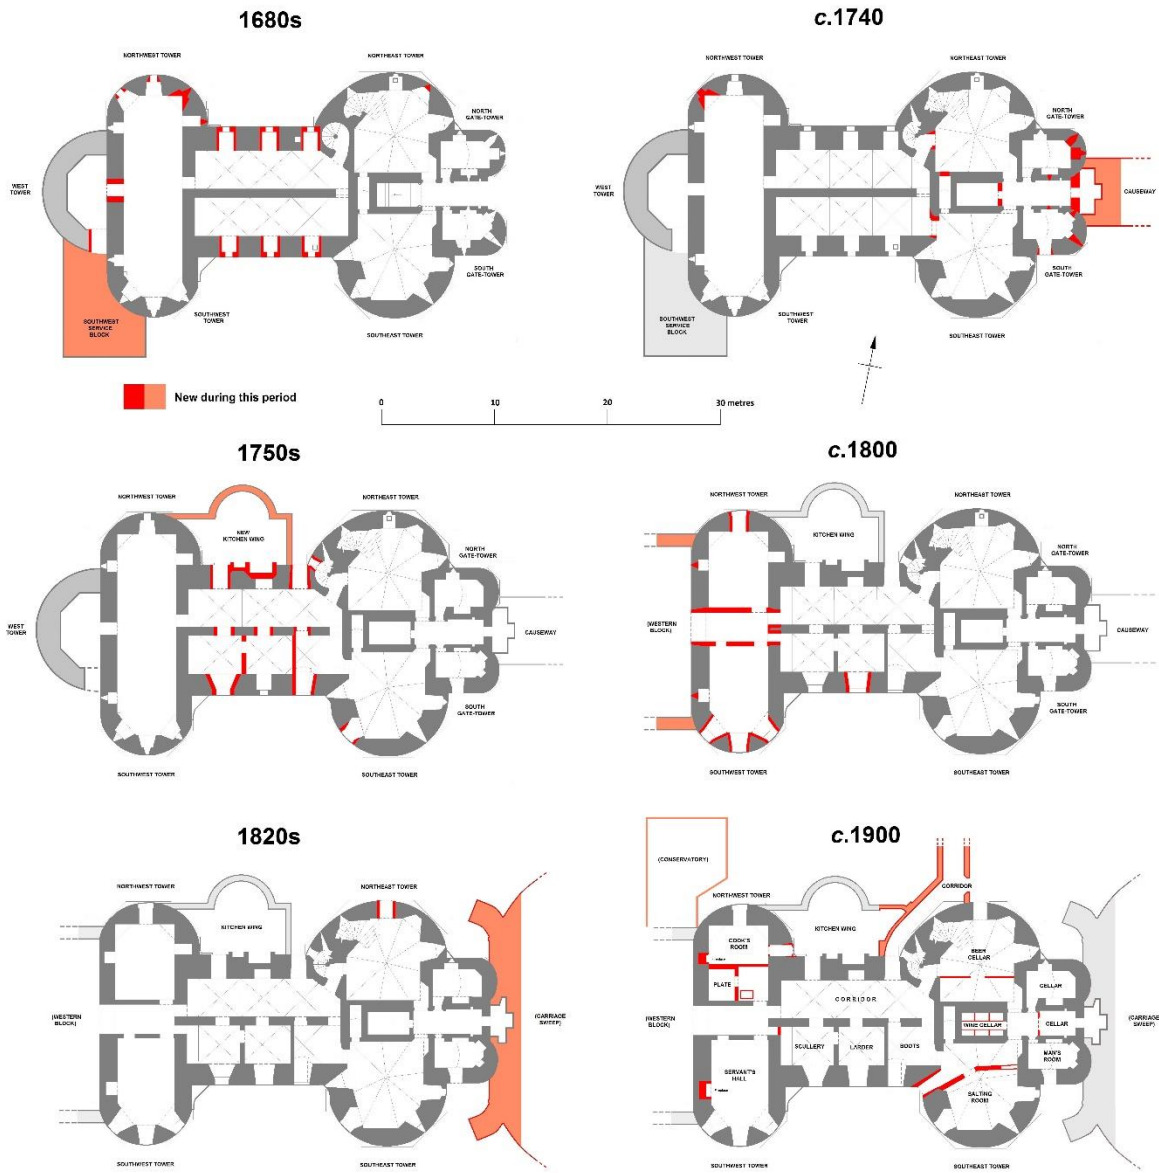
First-floor plans of Picton Castle showing post-medieval development (1680s plan conjectural).
